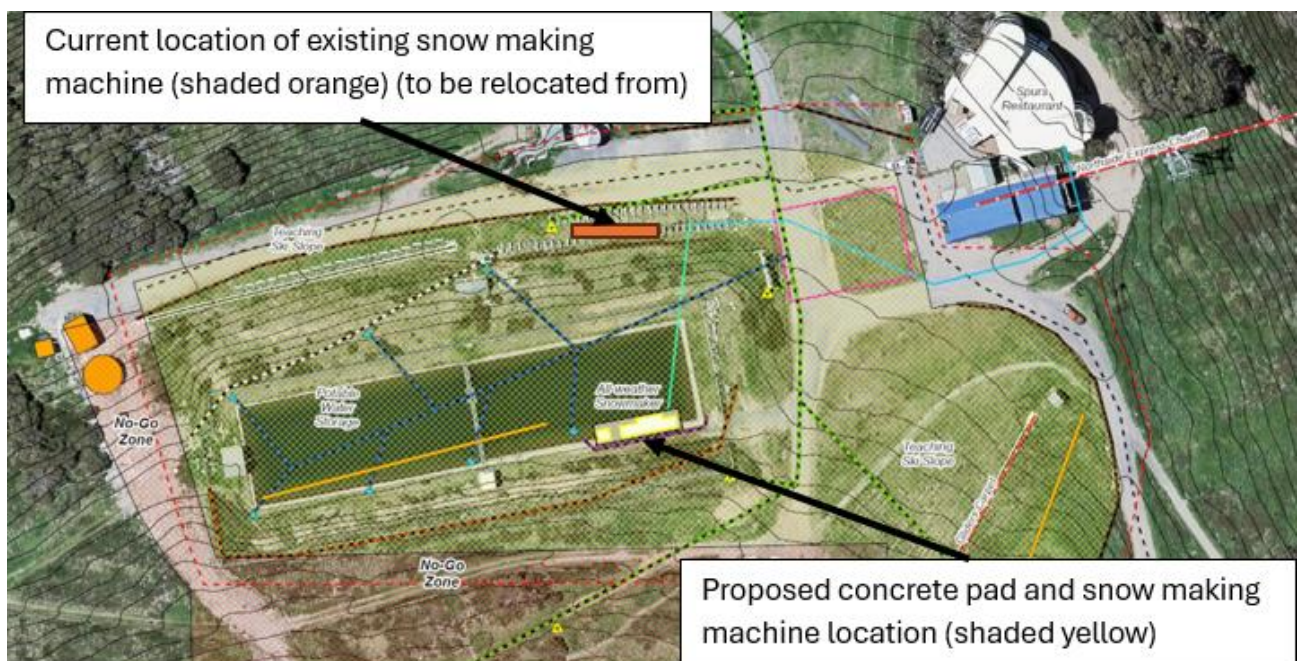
Existing location of snow making building (before relocation) (Source: Application)
